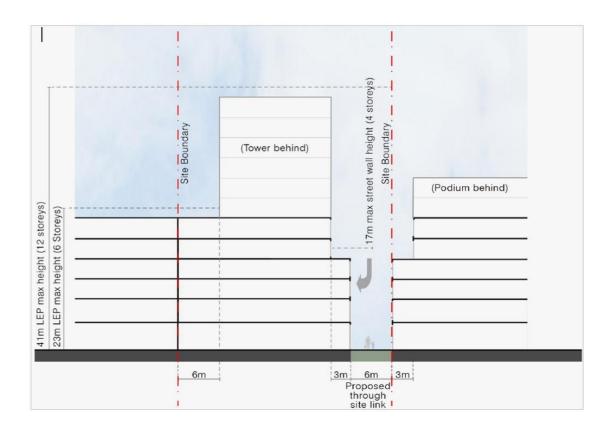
Amalgamated Site 5 - Typical East-West Section
